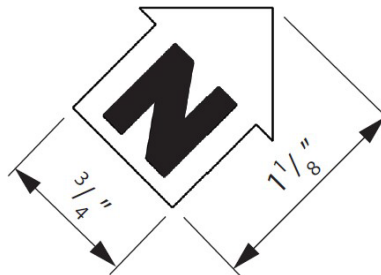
Standard Structure Detailing Cell (North Arrow)
